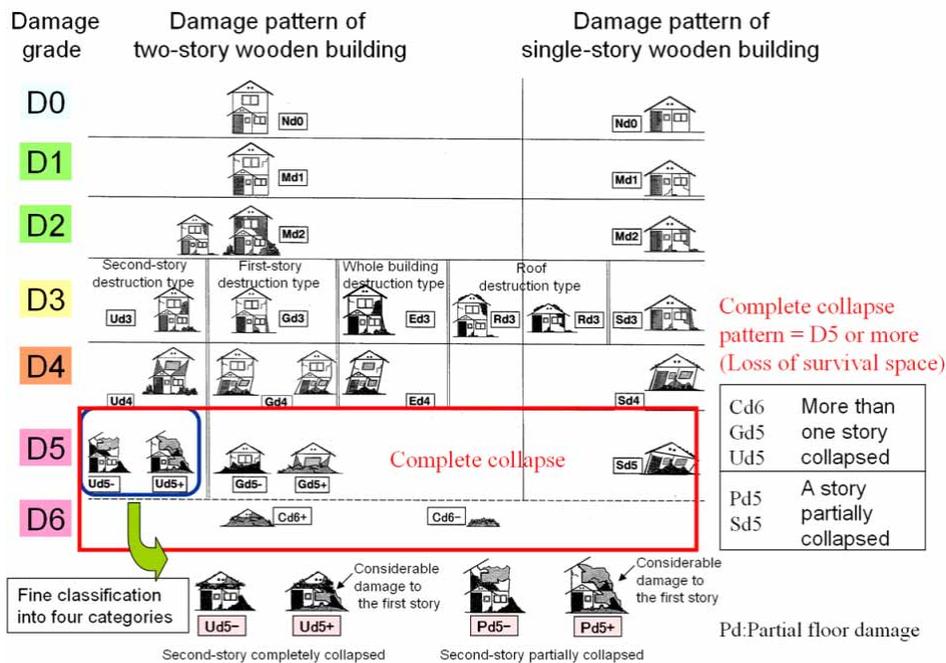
Building damage pattern chart for wooden buildings (Source: Okada and Takai [9])
